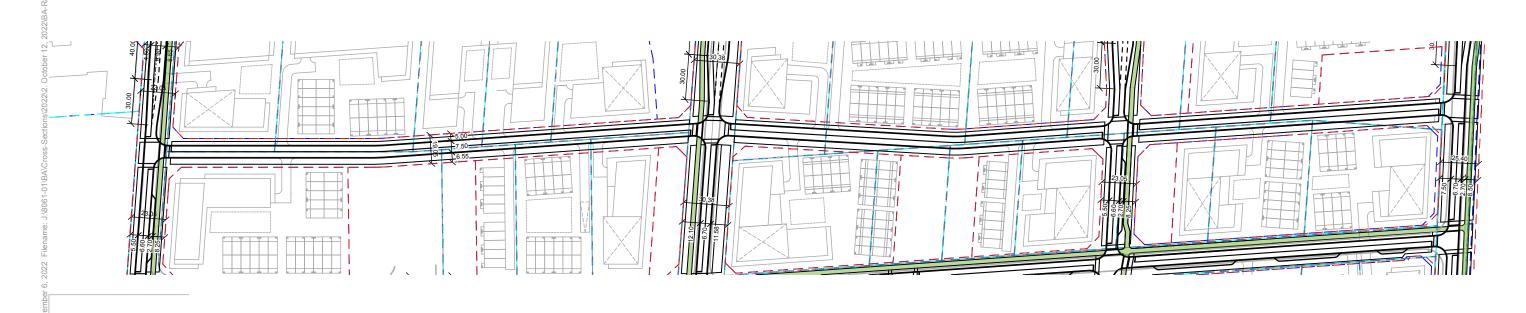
HYDRO ROAD - FUNCTIONAL PLAN & CROSS-SECTIONS
